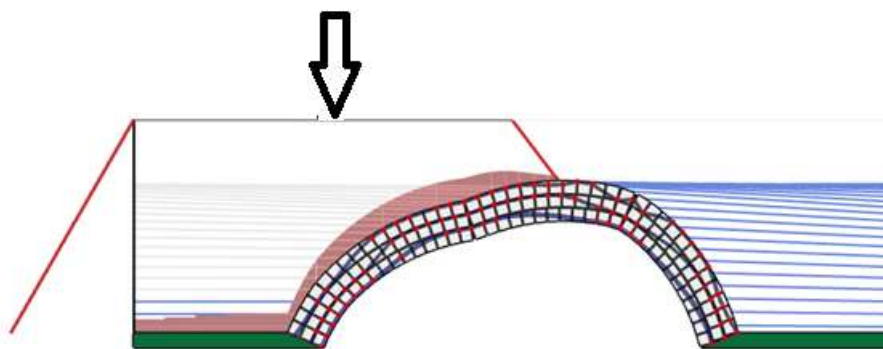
Collapse mechanism for arch loaded by 3 m square footing, column position at arch left support
